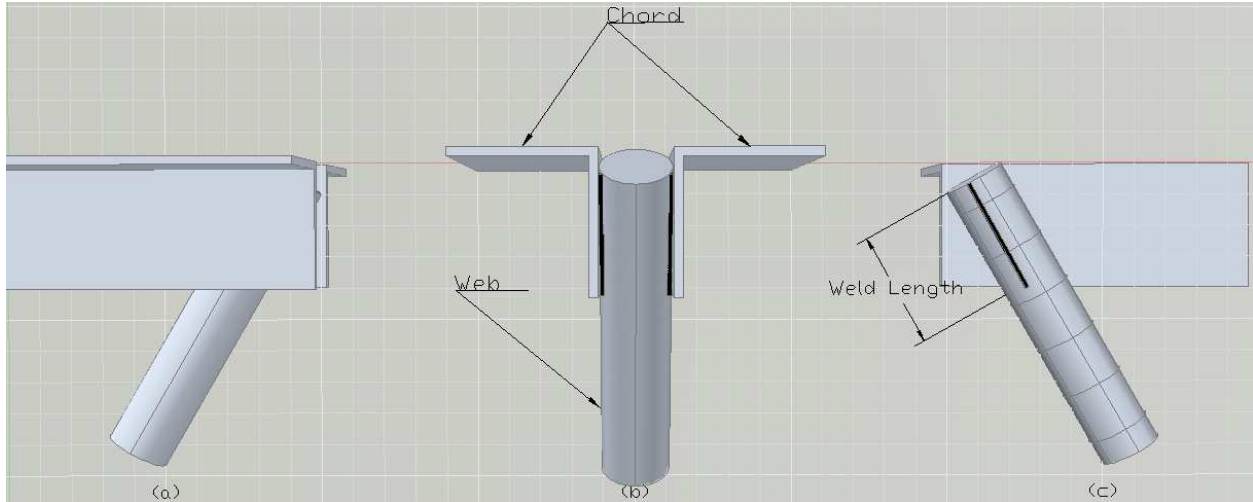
Rod Web or end rod connection to chord, a) side view, b) view looking down chord, c) weld position
